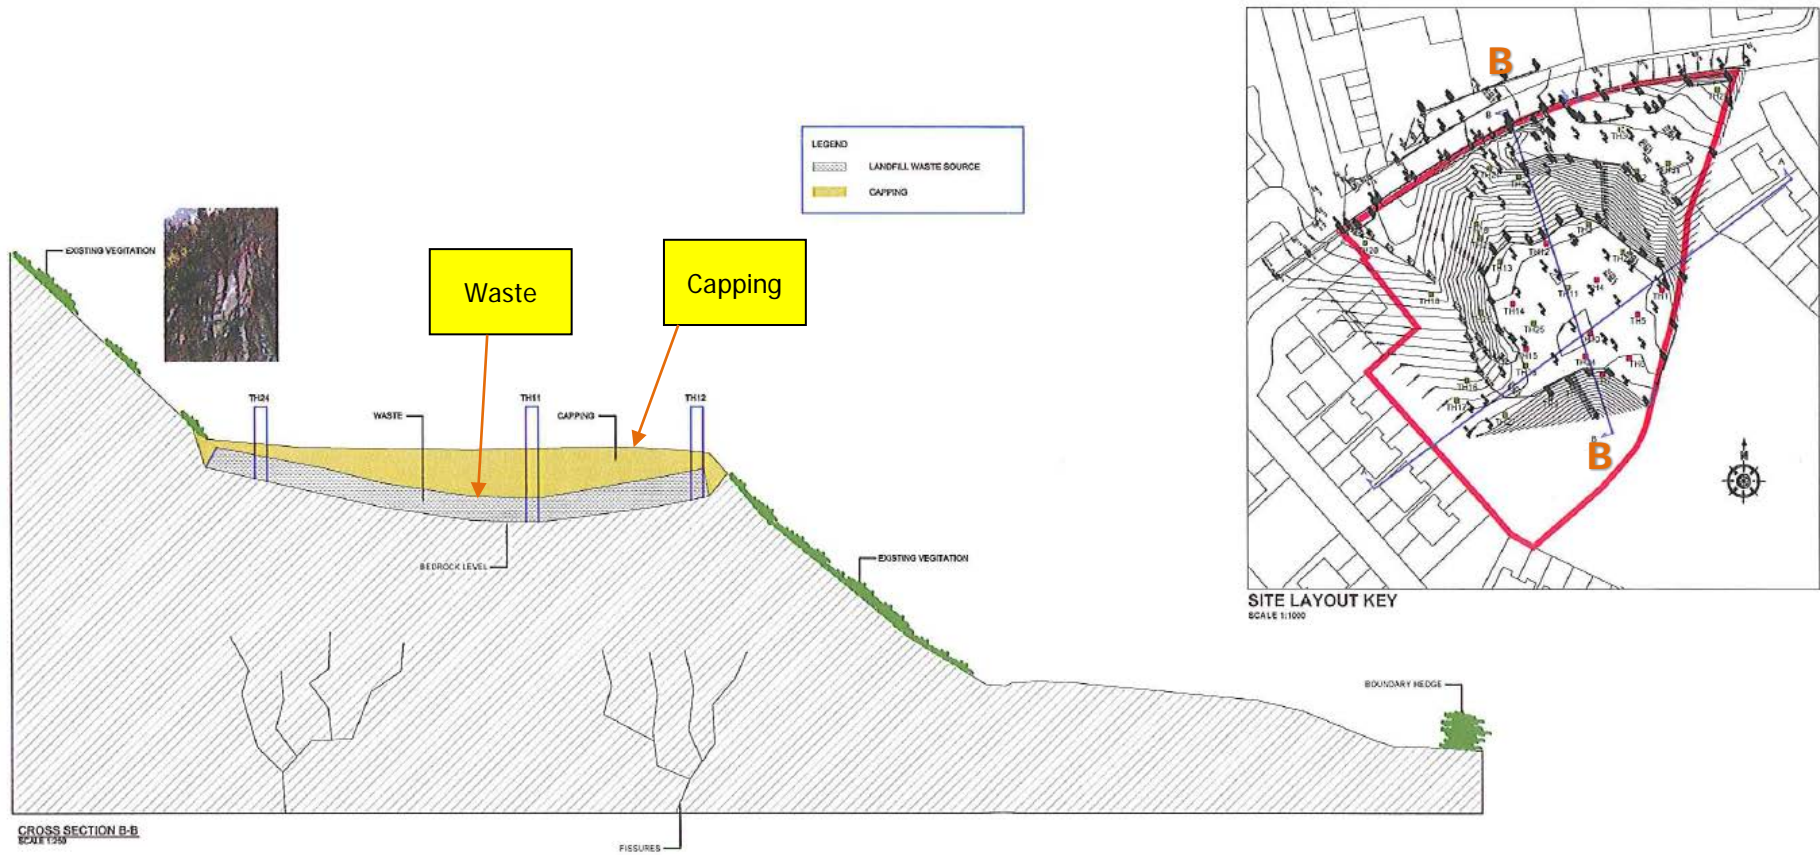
(b): Conceptual site model for Kingscourt Landfill site – Cross section B-B
